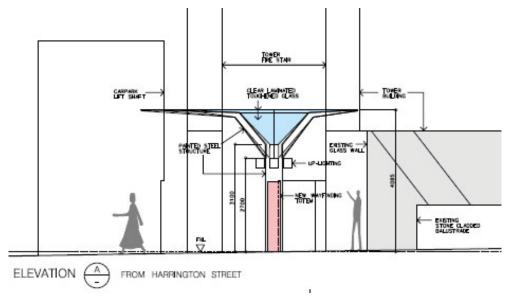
Harrington Street Elevation of the proposed glazed canopy in relation to the existing lift drum on the left, and the stair shaft behind
